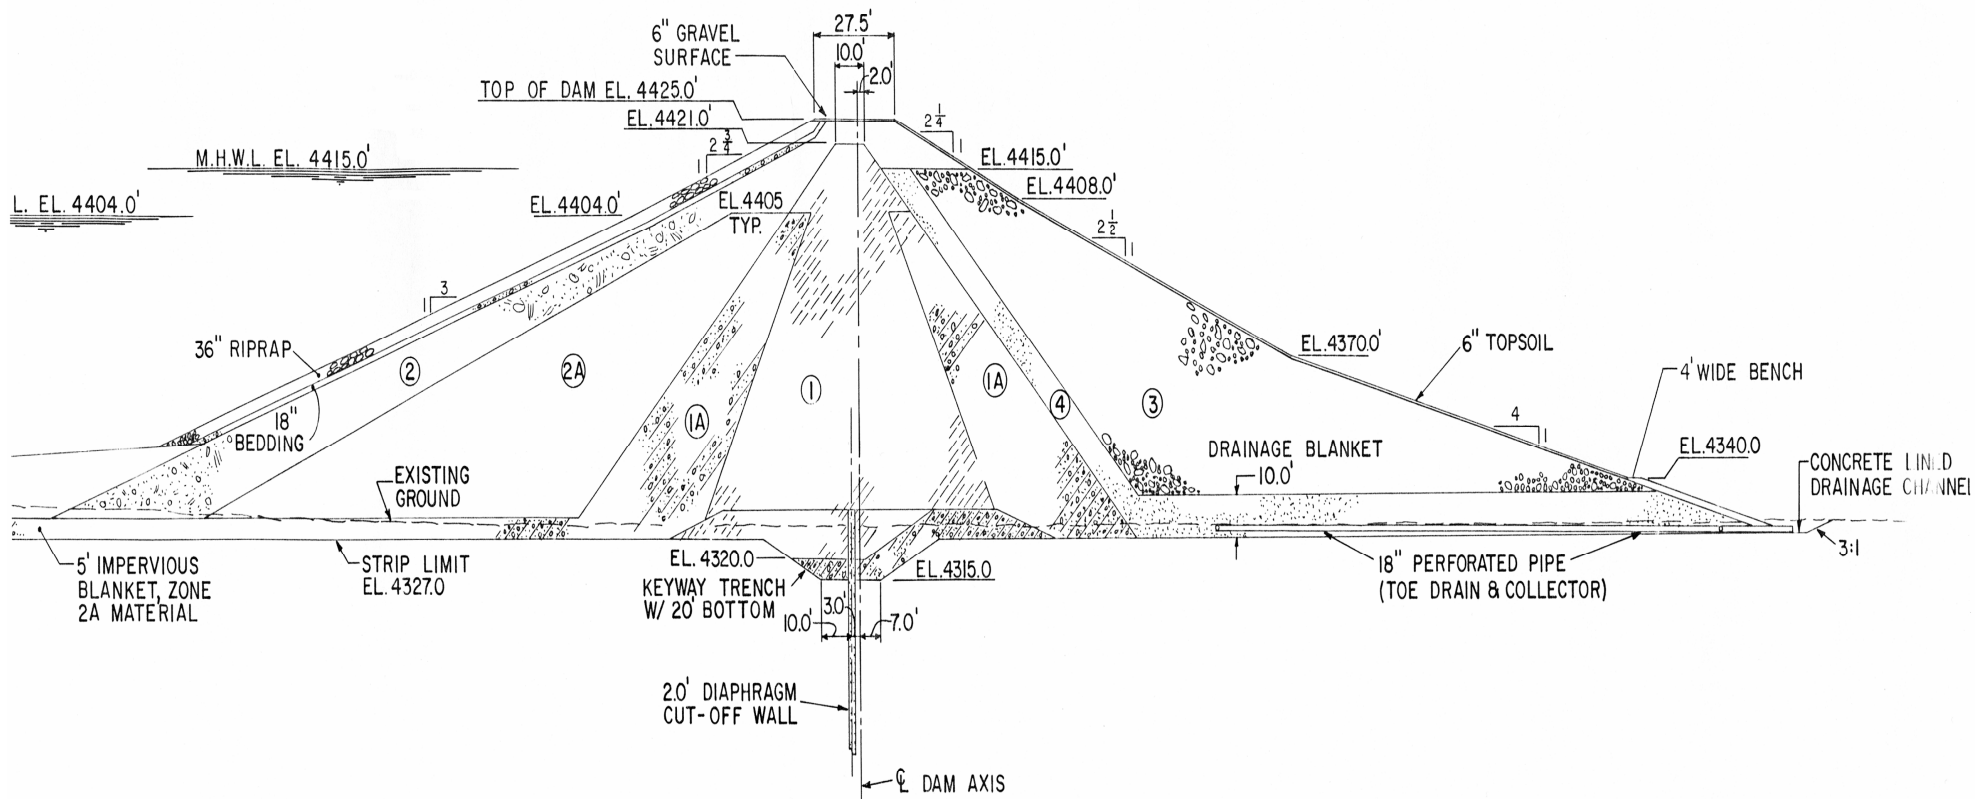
provides the Wyoming State Engineer's Office (SEO) permit application Grayrocks Reservoir dam cross section.
